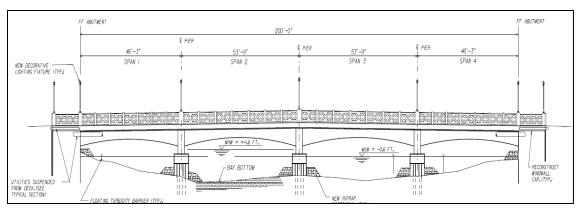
Venetian Causeway Bridge 2 (8DA14374), Elevation View
